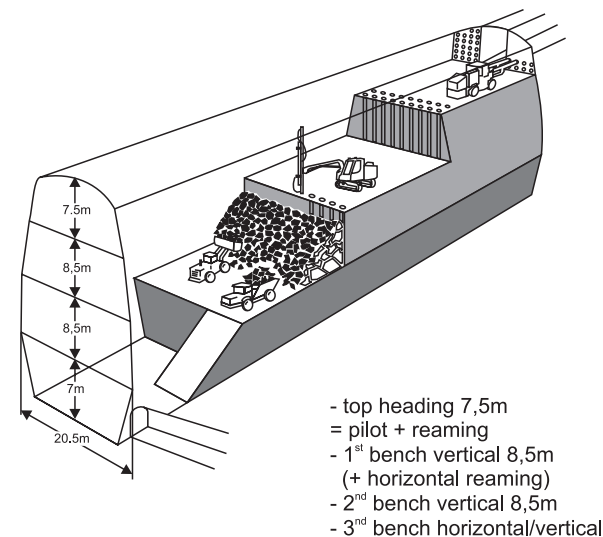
2. Drifting stages in underground oil storage.
